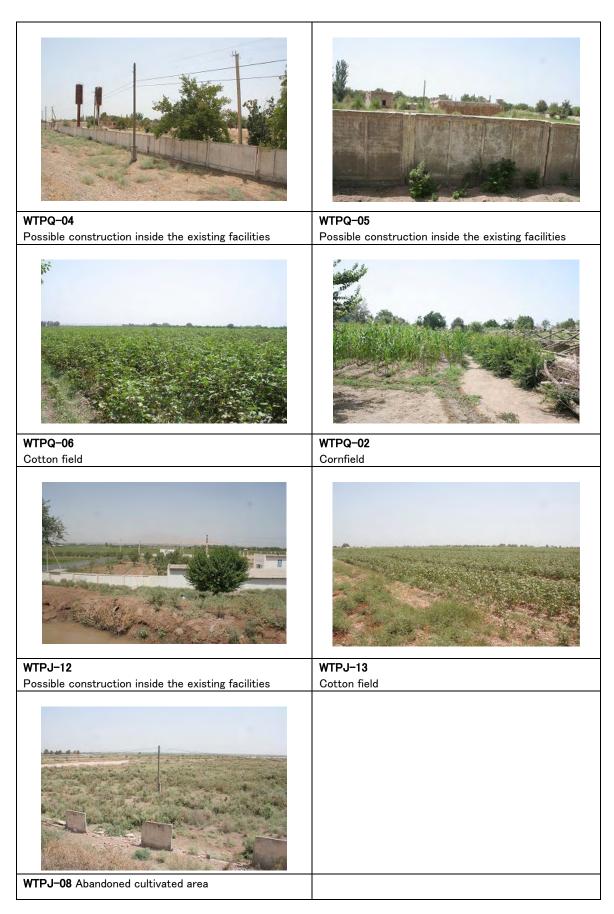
Picture of Proposed Construction Site for Water Treatment Plant
